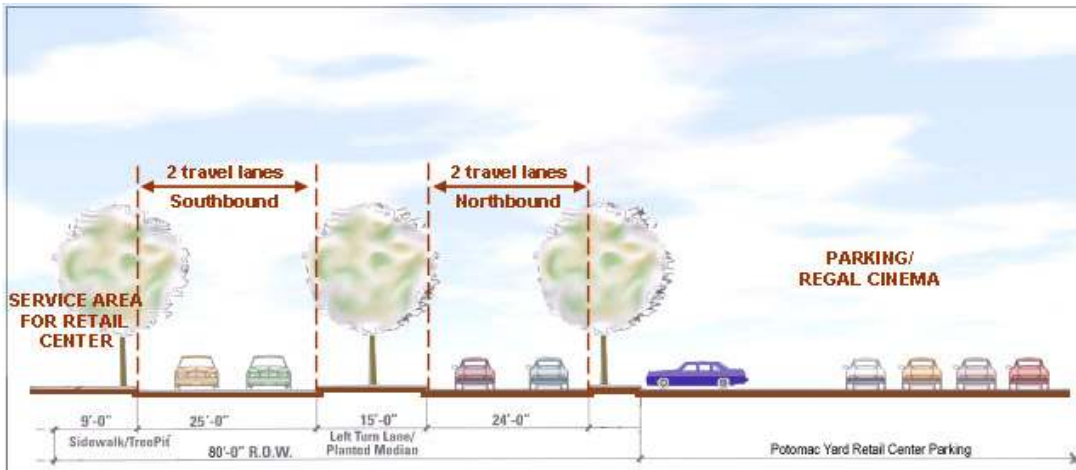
A. Looking North - Potomac Avenue in the Retail Center
